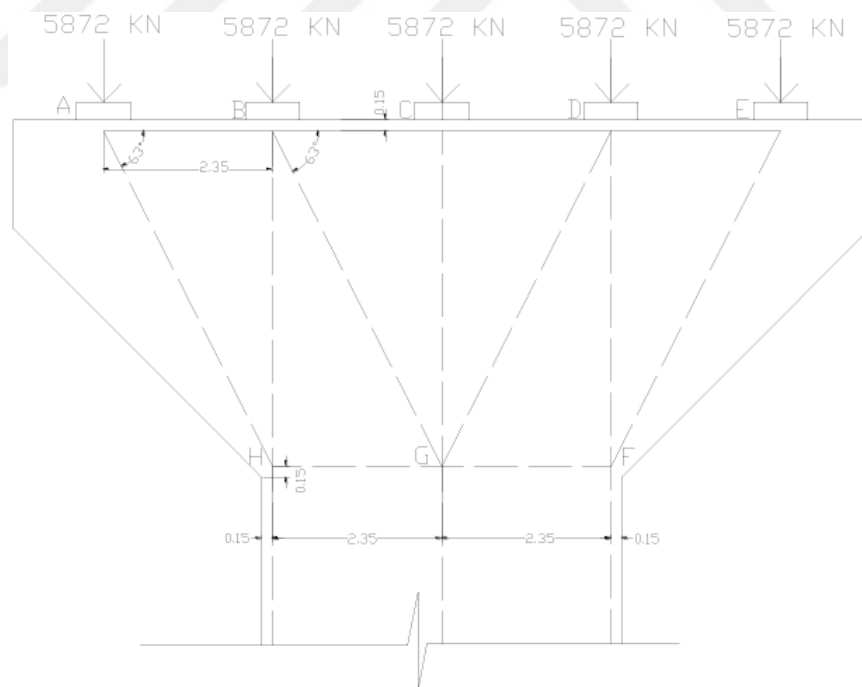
External Loadings and the proposed Strut-and-Tie Model of Pier Cap 4 (Bedru, 2014)
